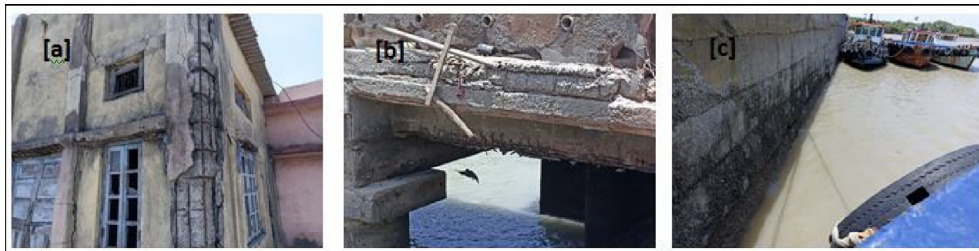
(a) Old office/storage building; (b) Old bridge deck structure; (c) Efflorescence Staining at face of jetty.
